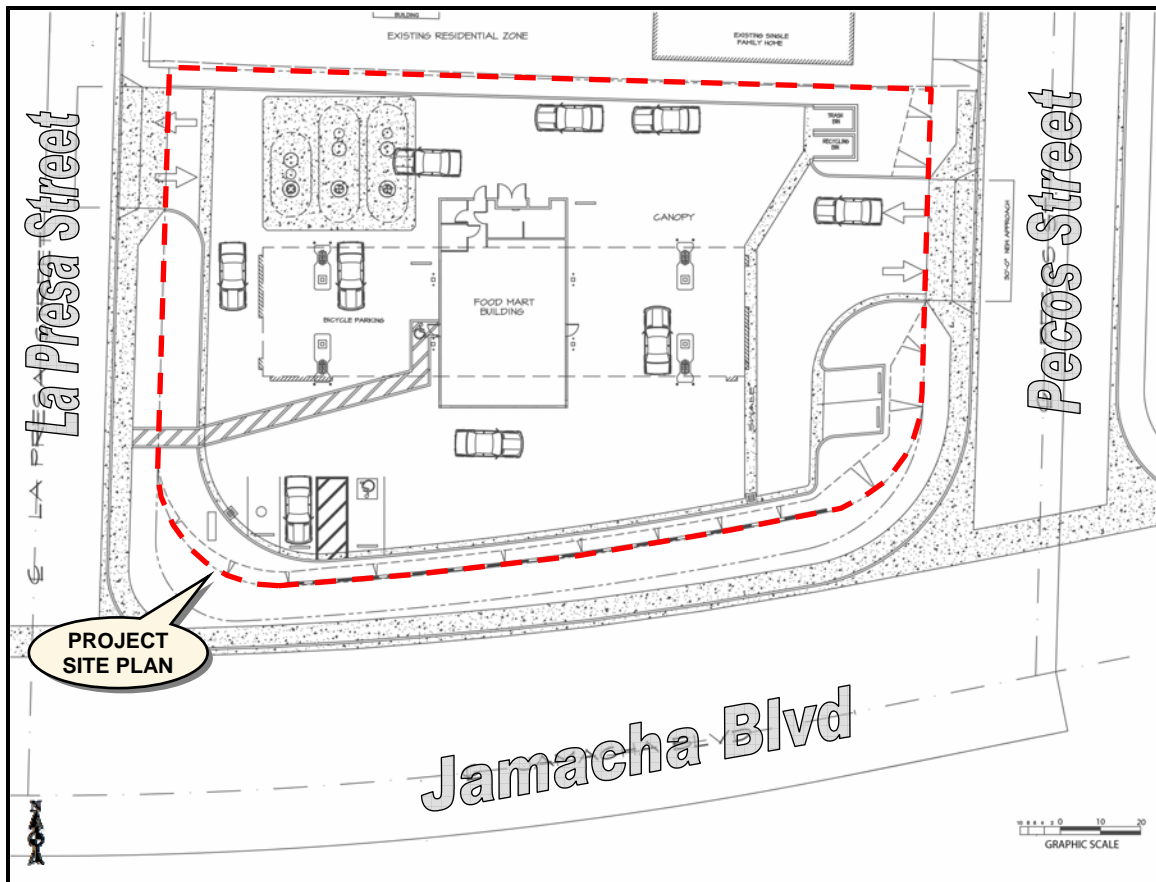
Proposed Site Plan – STARCO Food Mart (Gary Engineering 2/07)
